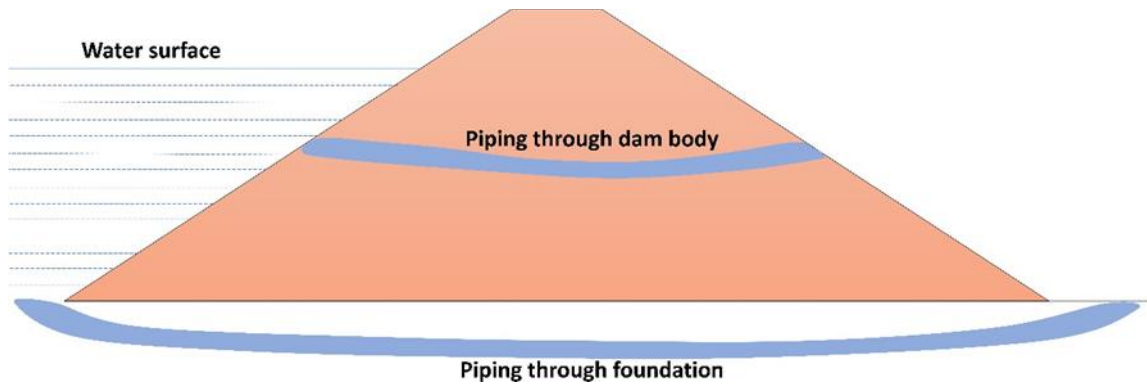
8 Piping through dam body and foundation The following measures are usually adopted to prevent piping failures.
